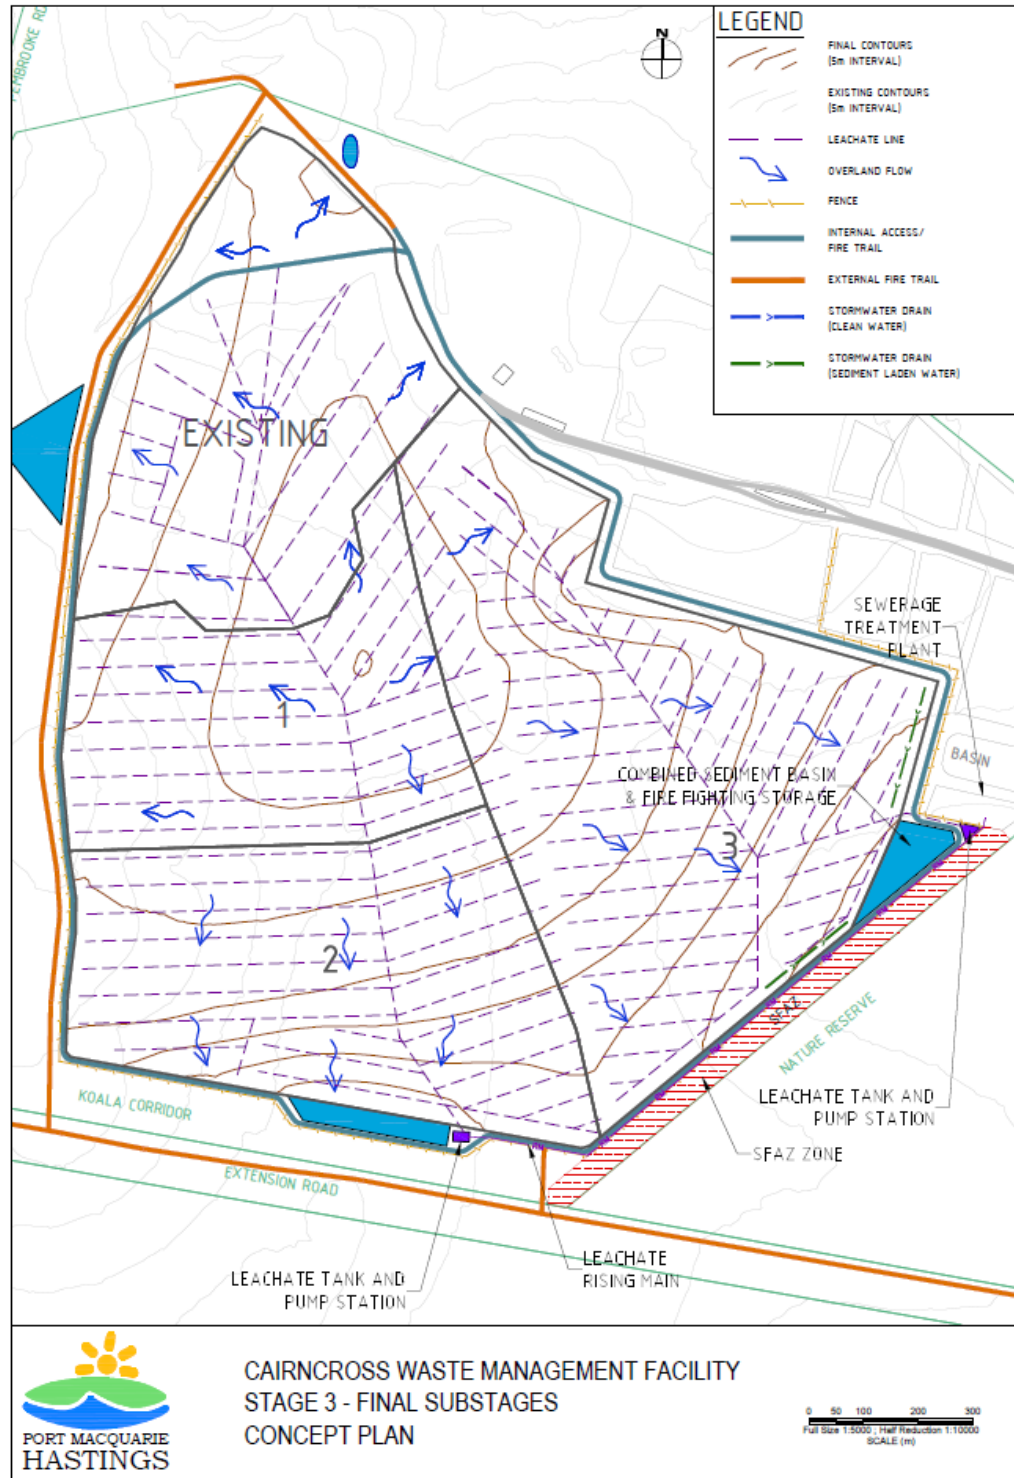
Proposed landfill layout and stages (Stage 3)
